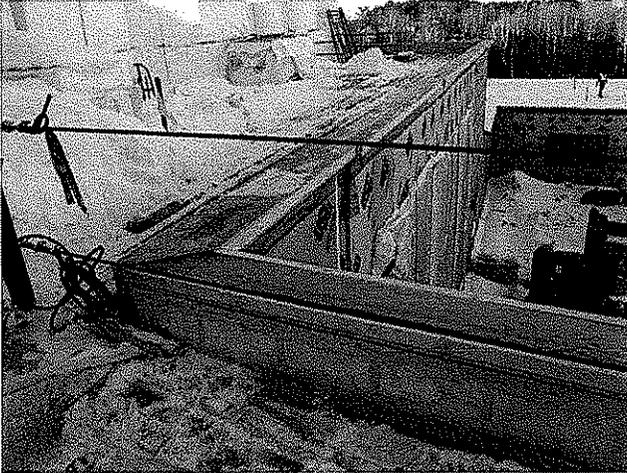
View north from the Classroom Wing roof. January 17, 2011.
